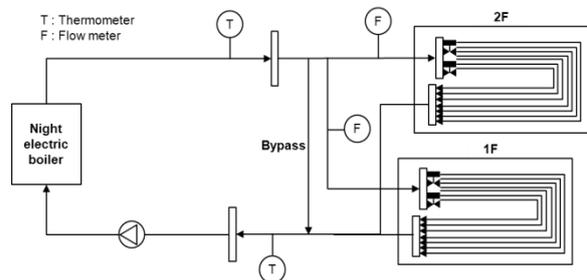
Schematic diagram of a radiant floor heating system with a night storage electric boiler in the 1st case building
